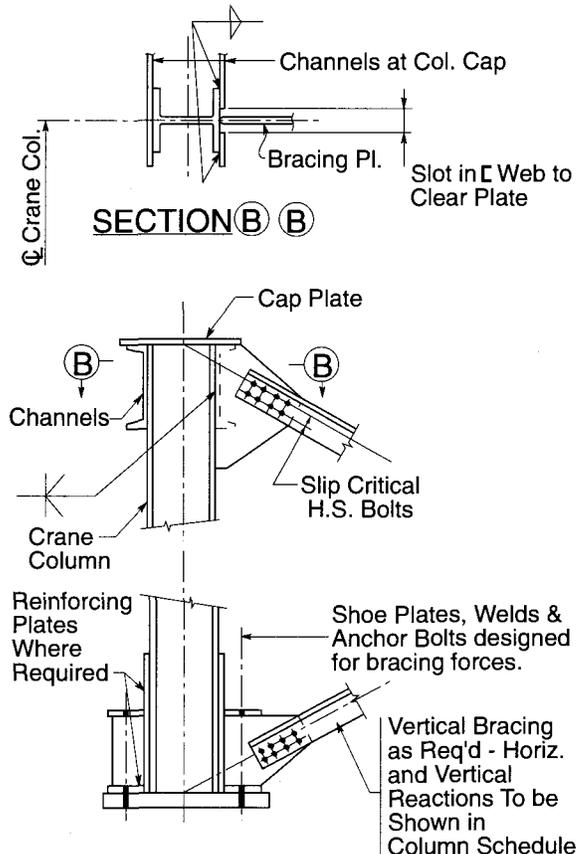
Column Brace Details for Fig. 17.2.2
